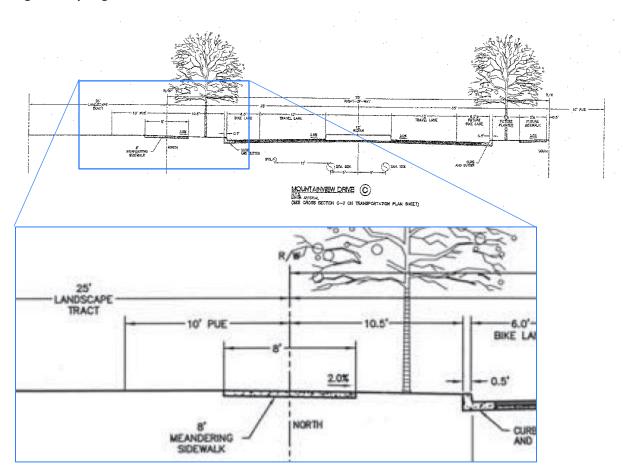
Springbrook Master Subdivision - Mountainview Drive Cross-Section
